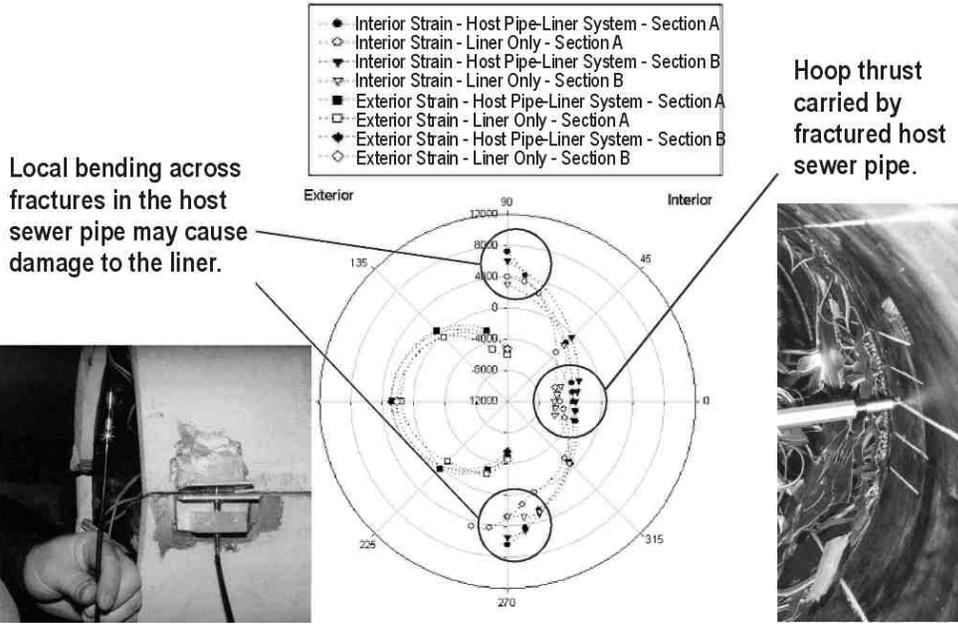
Lined pipe specimen tested under earth loading (Law and Moore, 2003b)
